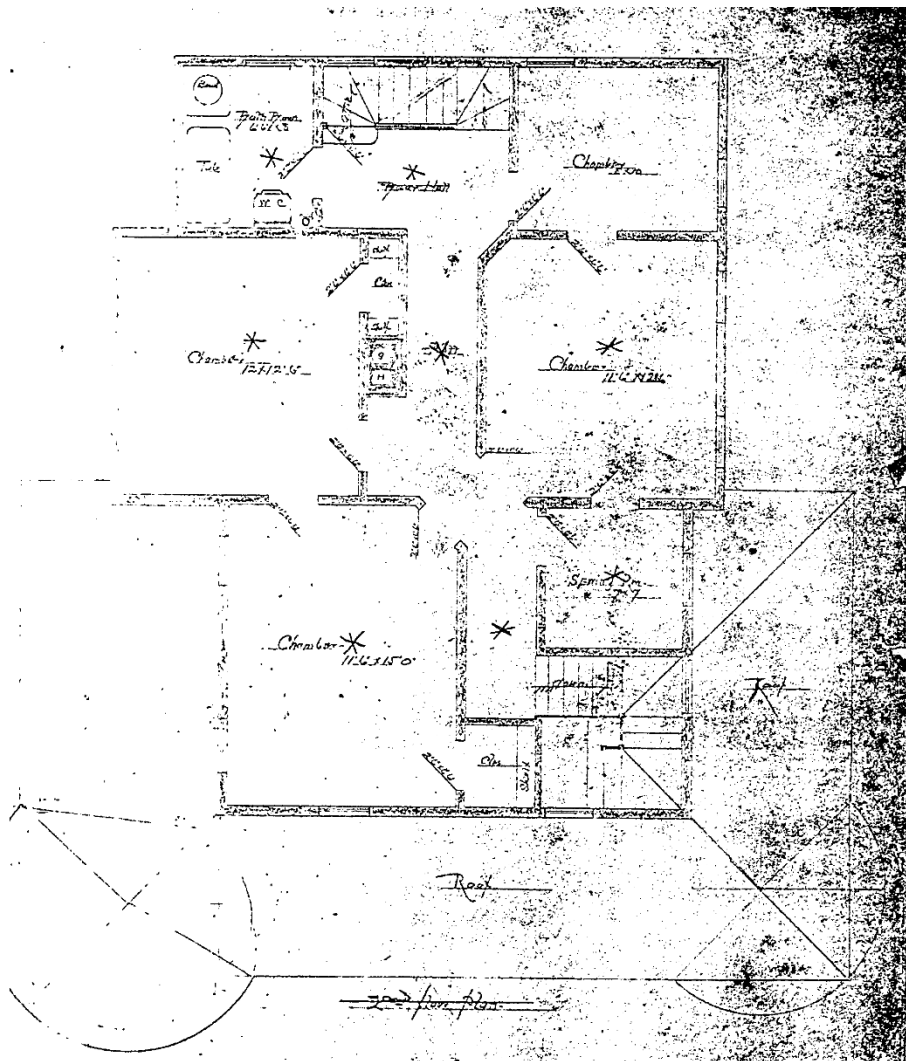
Second floor plan of the Edwin and Julia Reynolds House.
